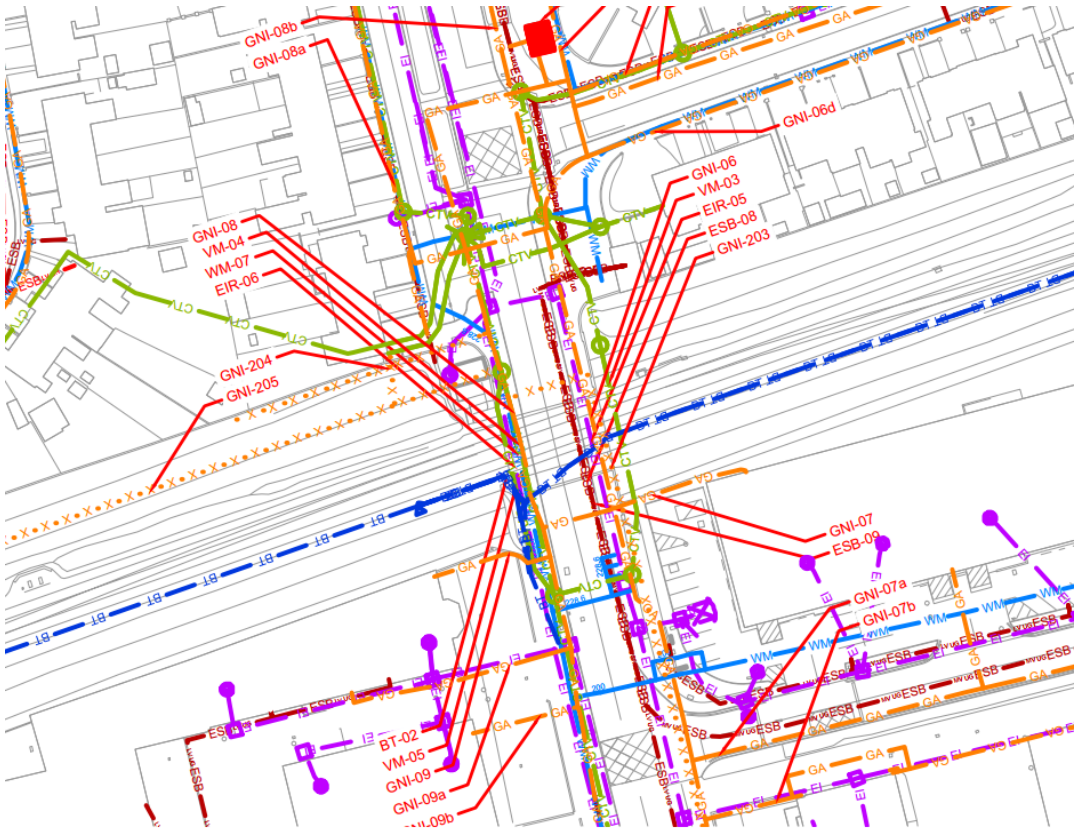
Existing Utilities at Kylemore Road Bridge (OBC5A)
